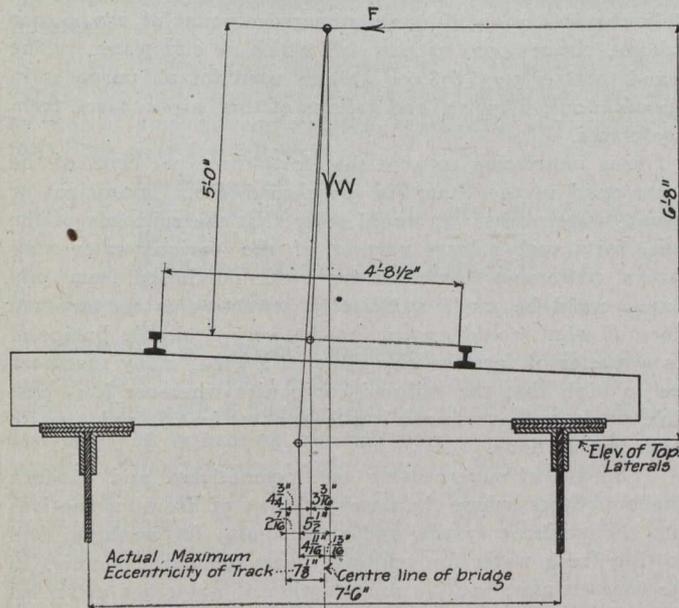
Standard Floor for Deck Bridges—Without Steel Floor Beams and Stringers.
